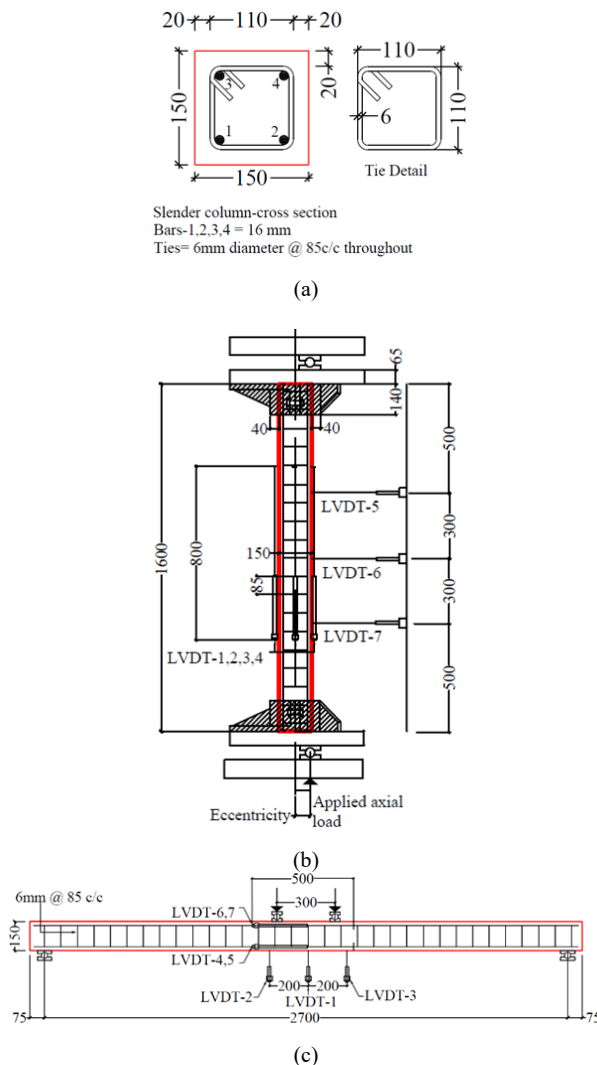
Test specimen details and instrumentation set up: (a) cross-section of the beam and columns; (b) concentrically and
